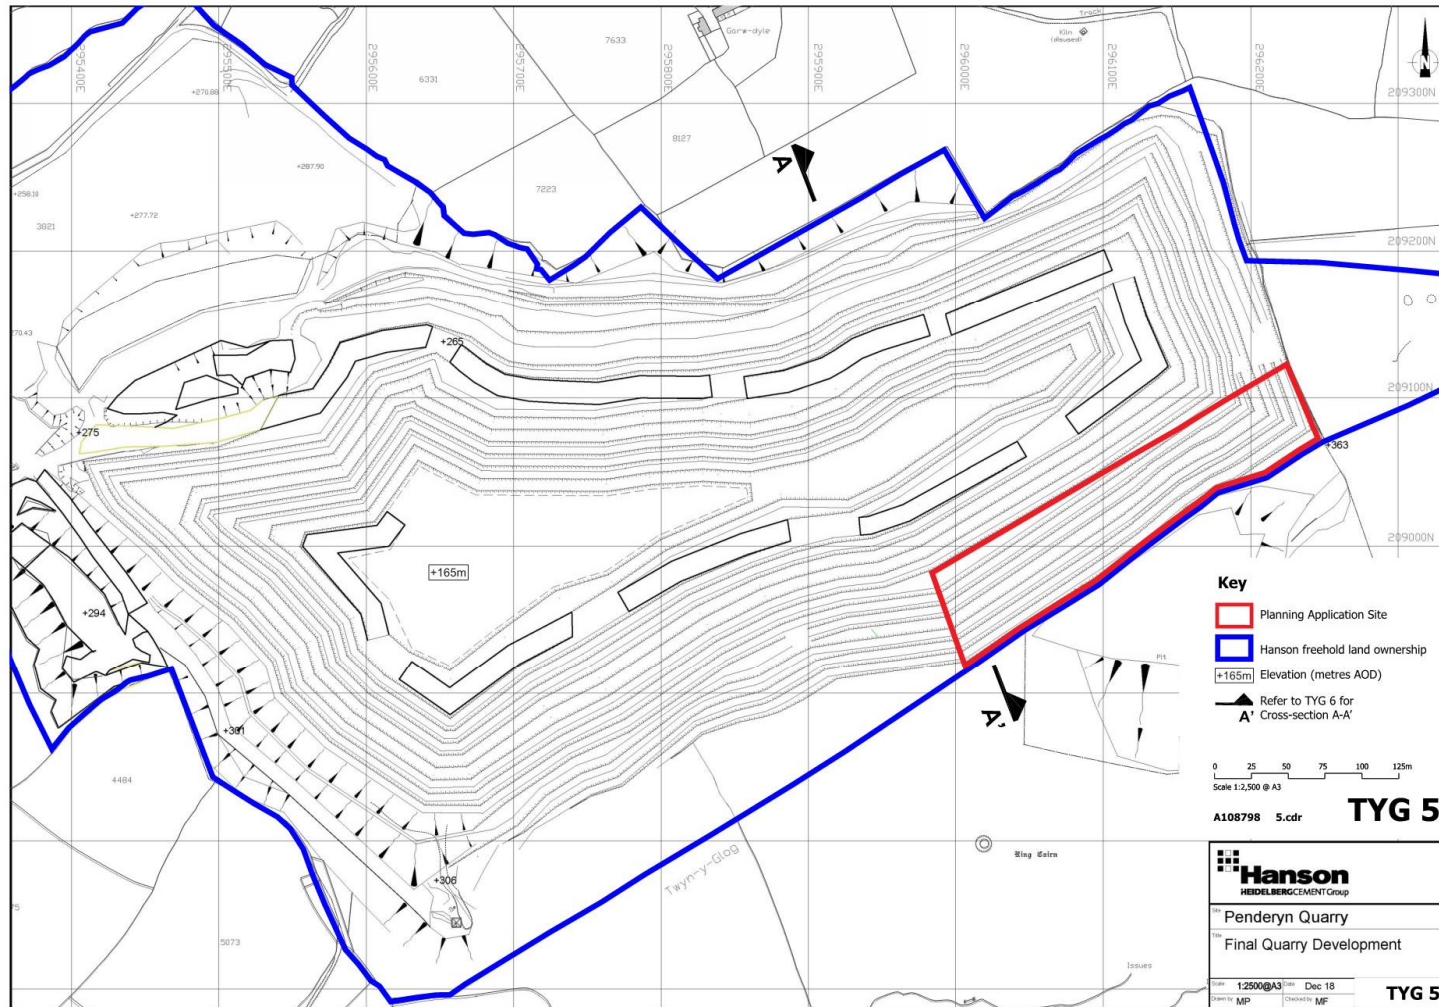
Final Quarry Layout (Plan TYG 5)
